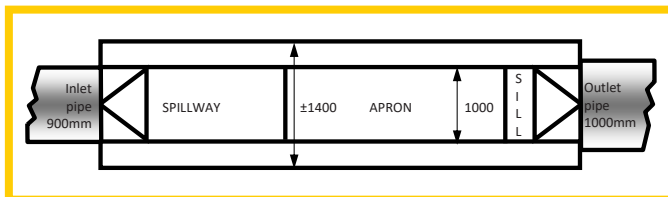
Sectional Plan through Drop Structure with Roof Removed (not to scale)
